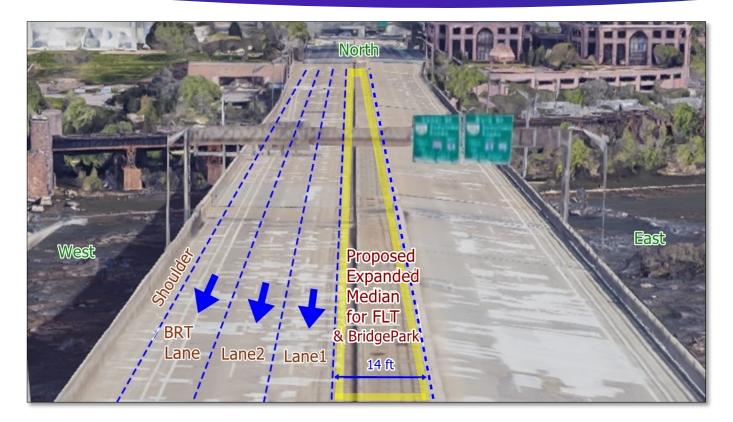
Proposed Plan for BRT Lane +2 Lanes + FLT/BridgePark in Widened Median
